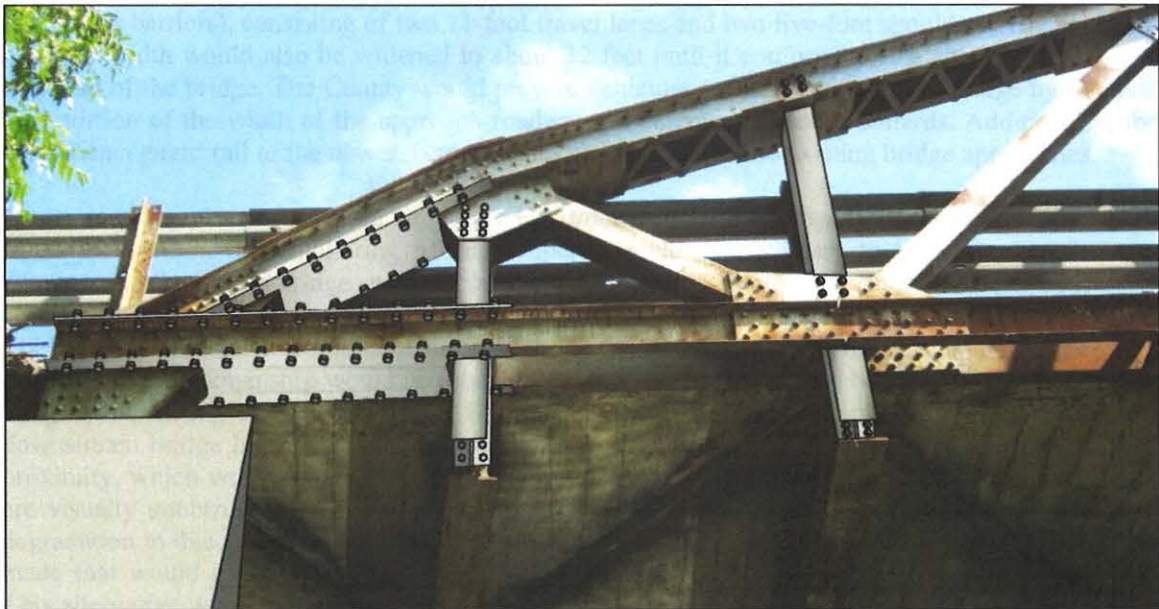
D: Simulation of alternative 2, showing the placement of steel plates, replacement of vertical "H" shape member and repair of the concrete Bent Cap. This would occur on all four truss ends, June 18, 2018.
